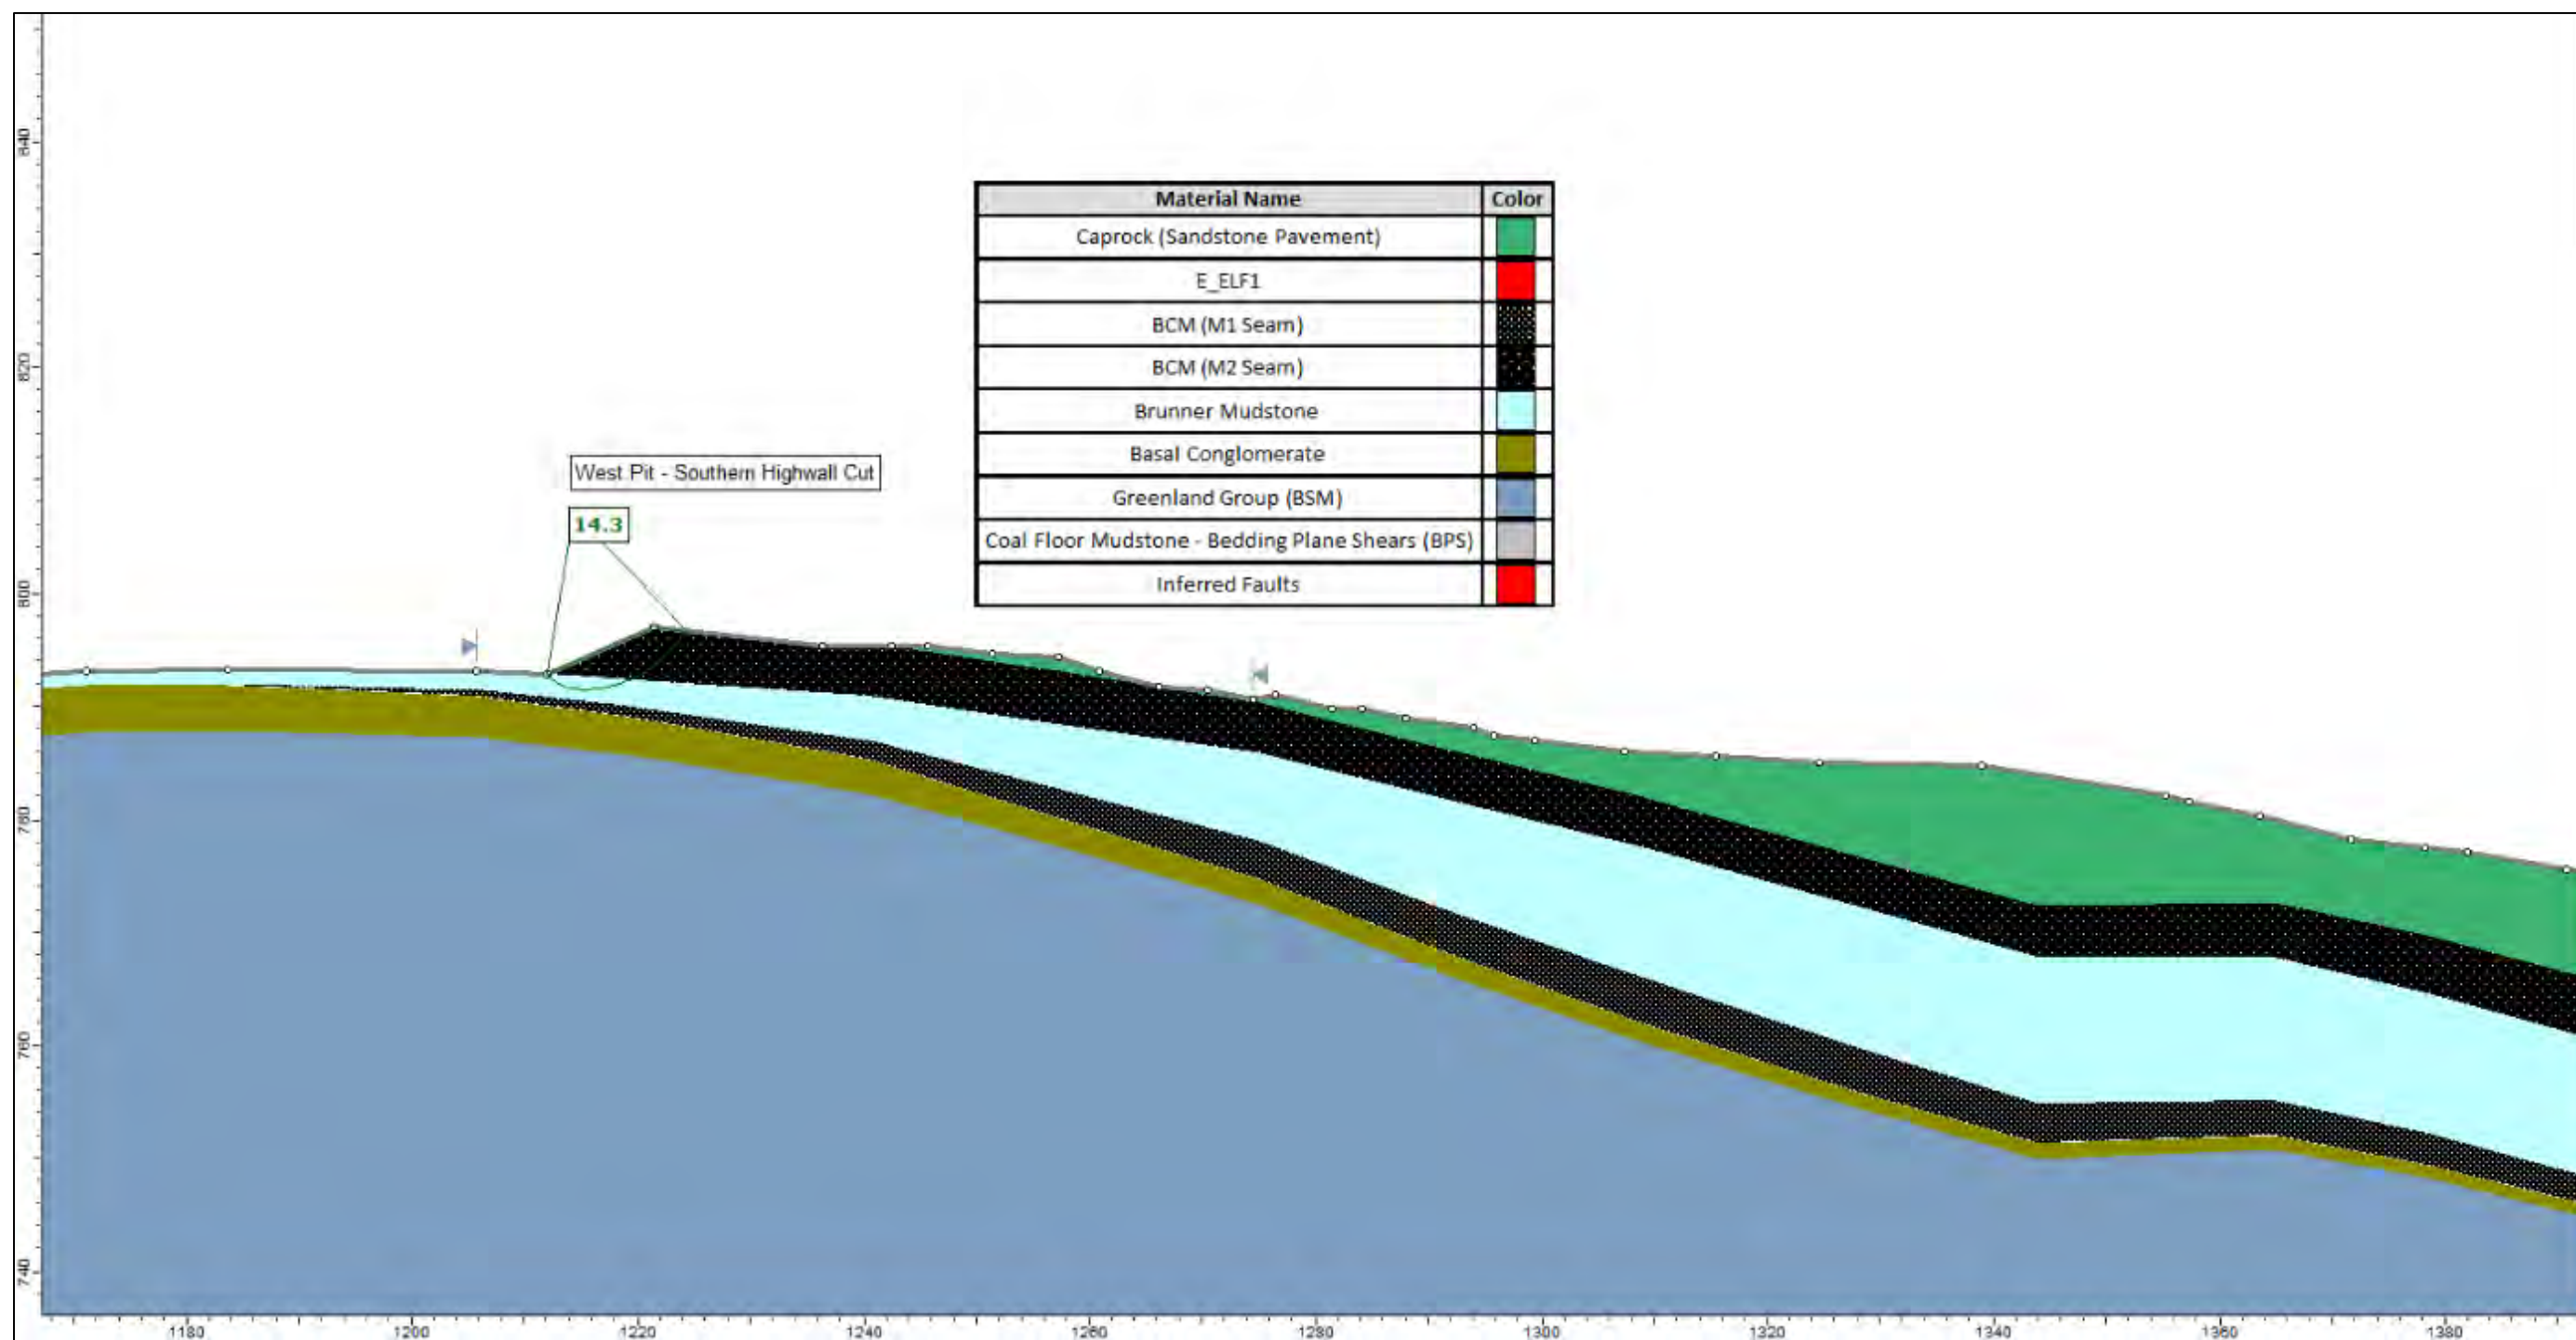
West Pit Highwall Cut - Section 105 -Static Conditions.
